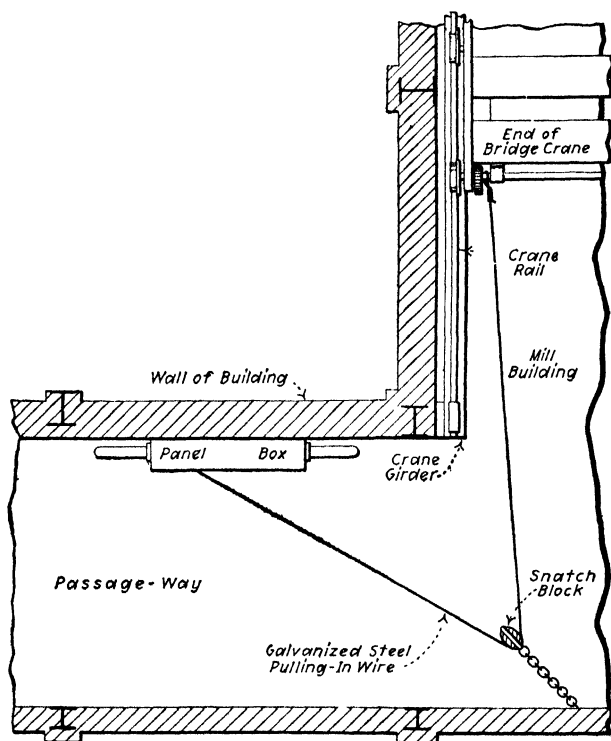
Plan view of the “pulling-around-a-corner” arrangement of the preceding illustration.
